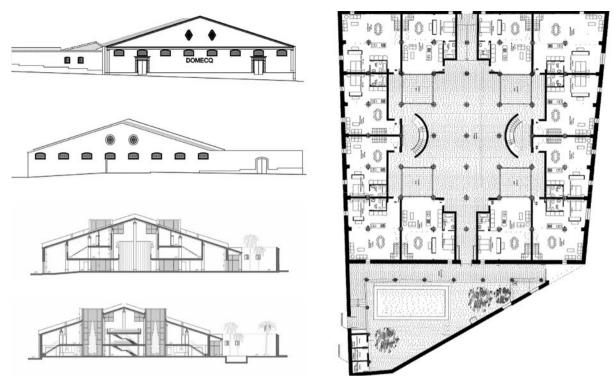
Floor plan, facades and sections of the converted bodega El Cantón (Sánchez, 2014, 41).
